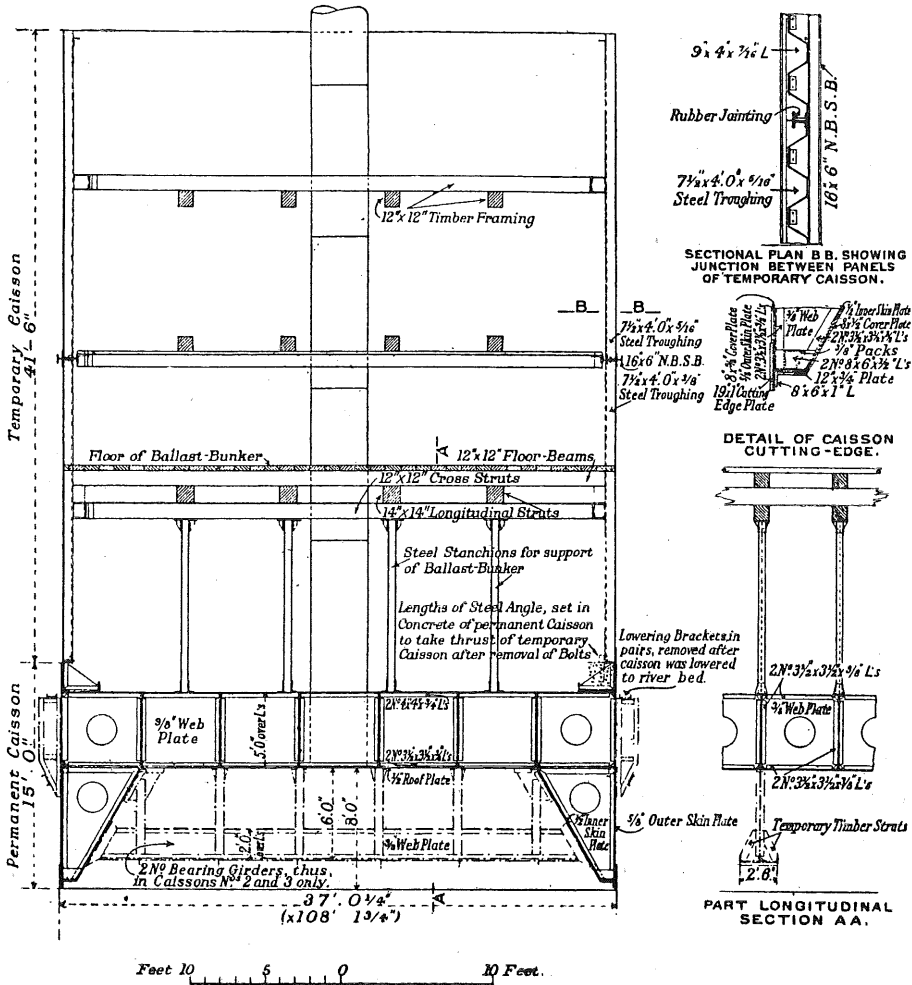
DETAILS OF CAISSON SHOWN IN FIG. 133.
